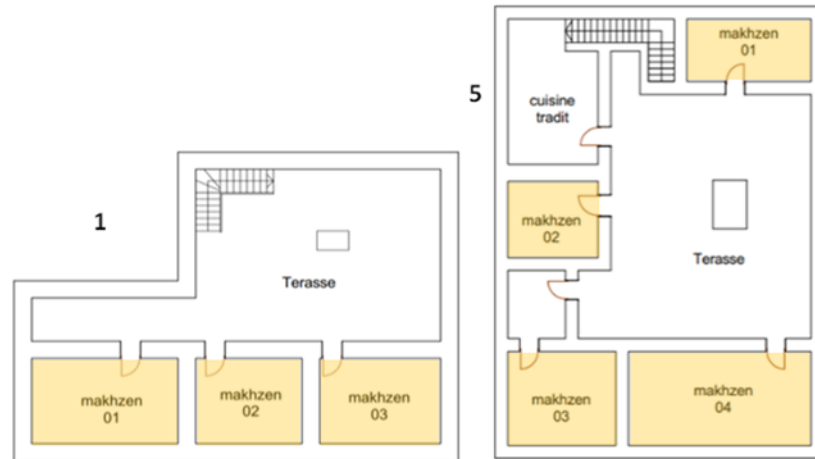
Location of the « Makhzen » storage space on the upper floor of traditional Biskrite houses. House 1 in the M'cid neighbourhood and house 5 in the Gueddacha neighbourhood.
